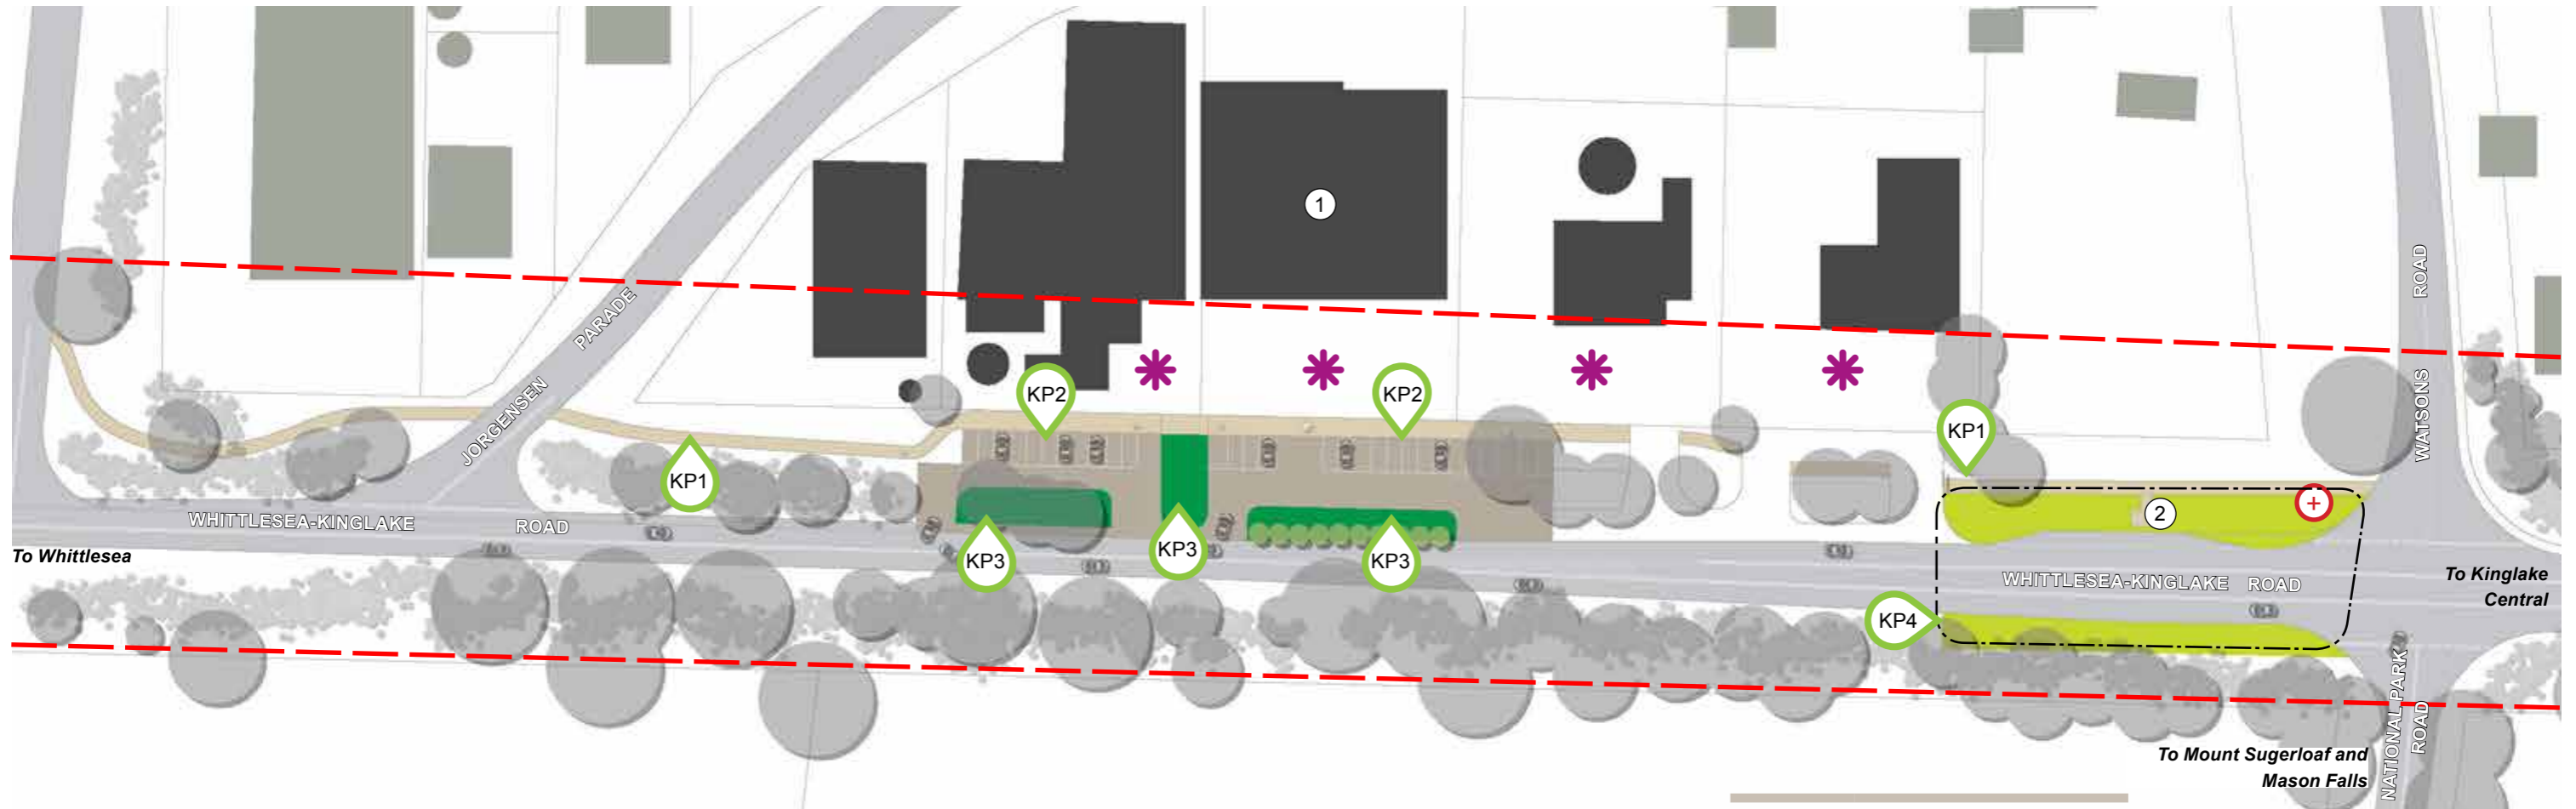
Kinglake West - Pheasant Creek proposed streetscape master plan
